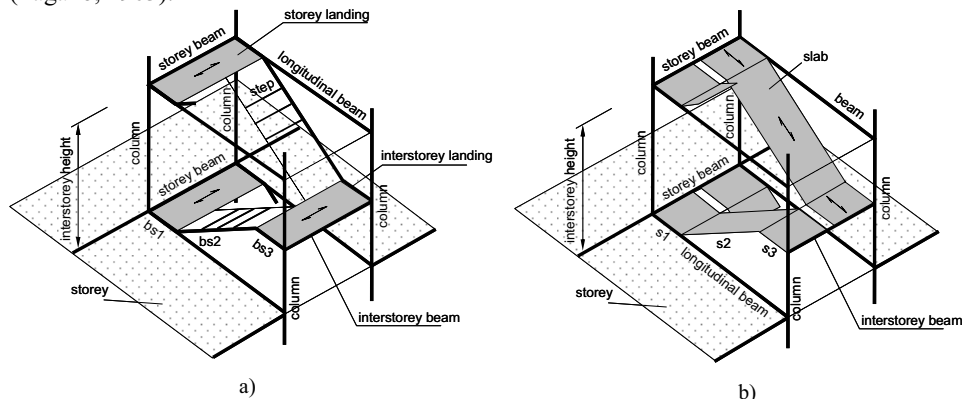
Stair typologies: (a) stairs type A with steps as cantilever beams, (b) stairs type B with simply supported steps.
